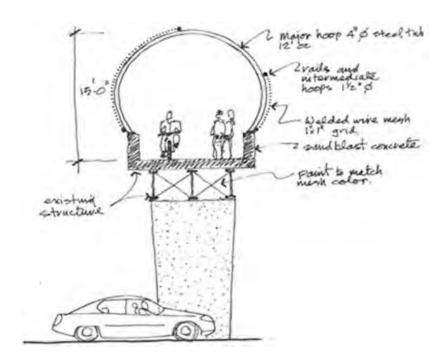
Proposed Option 1 Typical Section (Source: Dorton Design)
